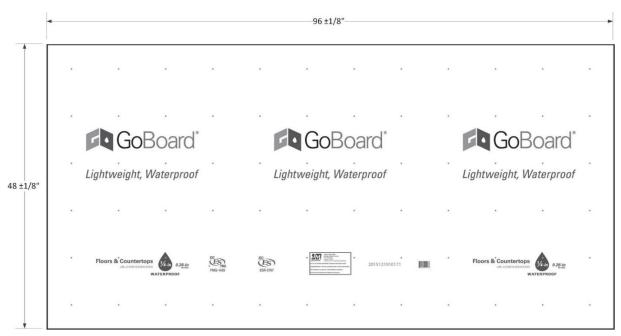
GOBOARD® 48-INCH X 96-INCH SHEET DIMENSIONS (1/4-INCH GOBOARD® IS SHOWN AS AN EXAMPLE; DIMENSIONS ARE THE SAME FOR ALL THREE THICKNESSES)
